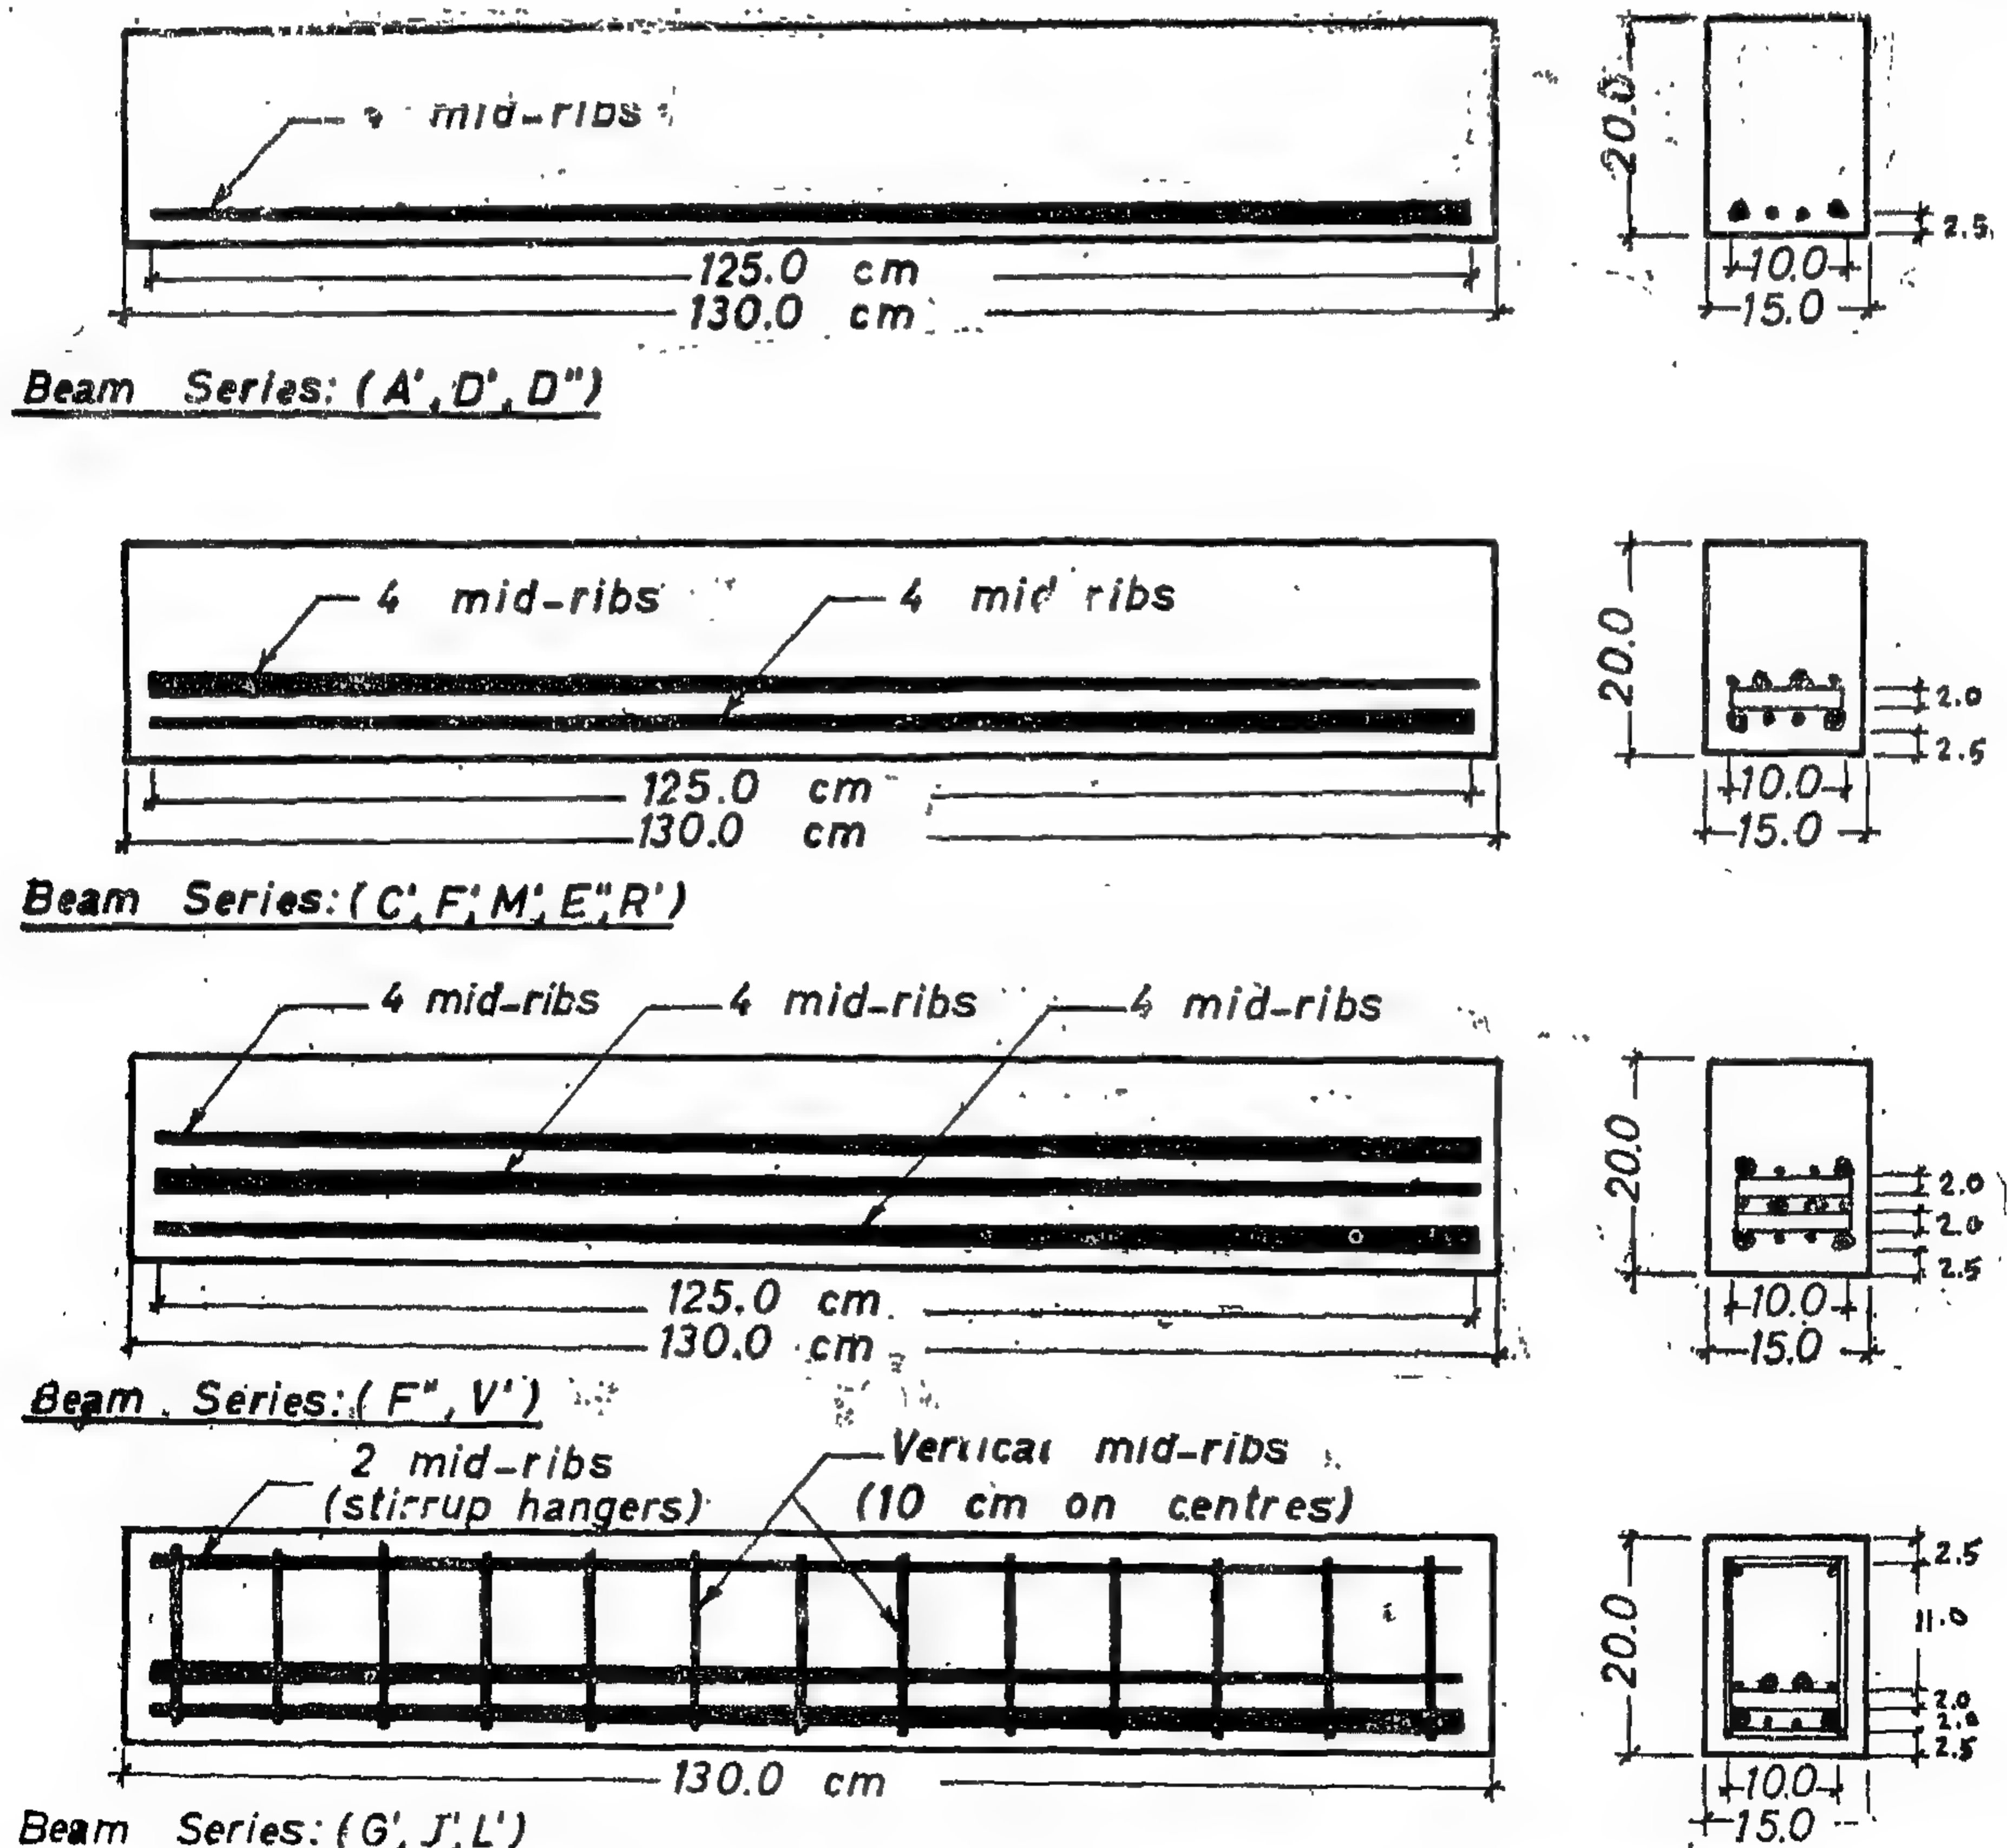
RECTANGULAR CONCRETE BEAMS (15 × 20 × 130 cm) REINFORCED WITH DATE-PALM MID-RIBS.
